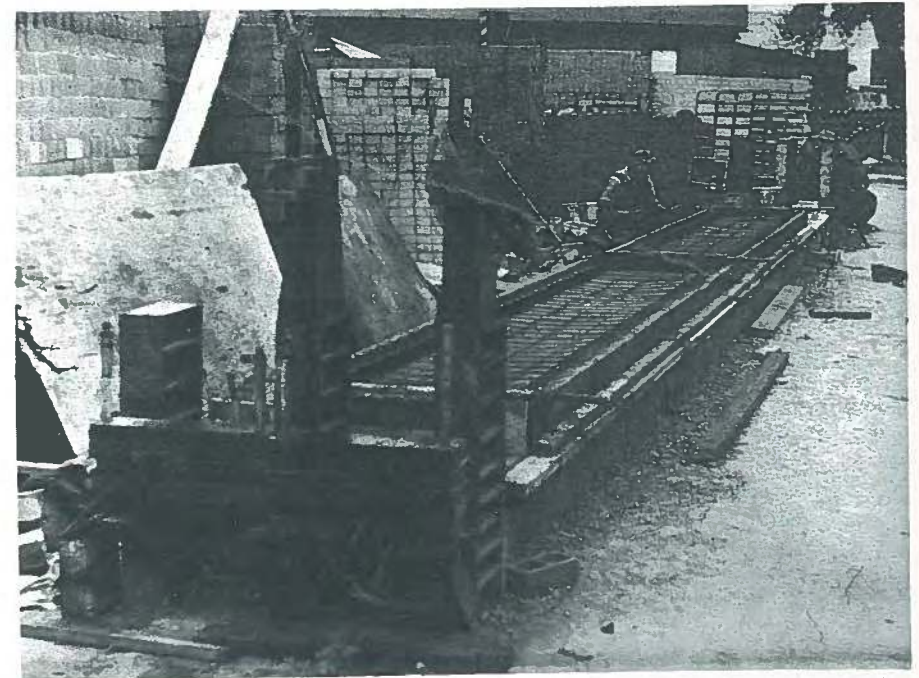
Forms and reinforcement are placed in Colorado's first pretensioning bed prior to casting channel slab.
